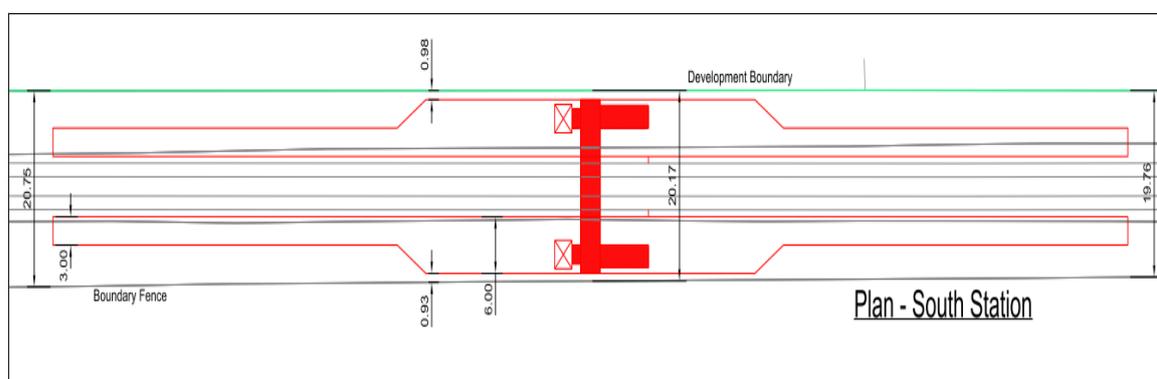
Generic platform configurations with AFA footbridge lifts and stairs
